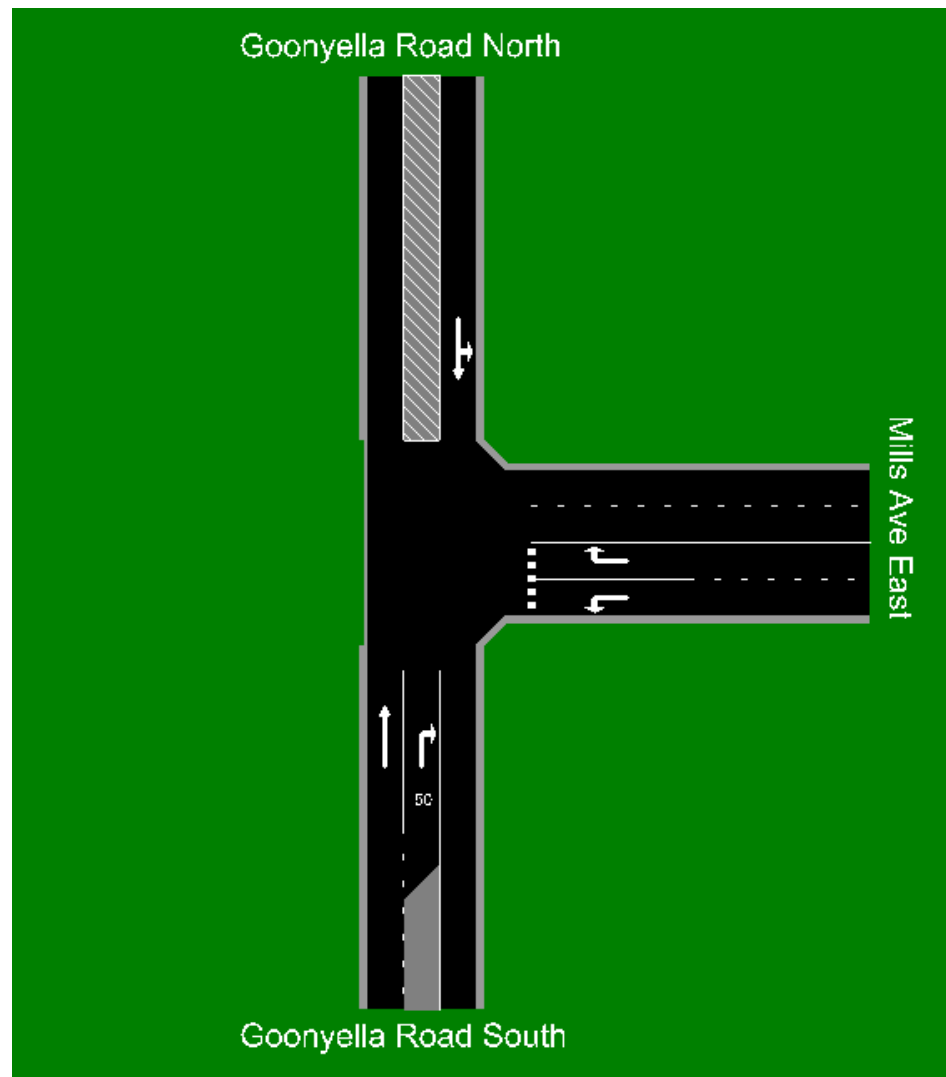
Mills Avenue with Goonyella Road Intersection Layout
